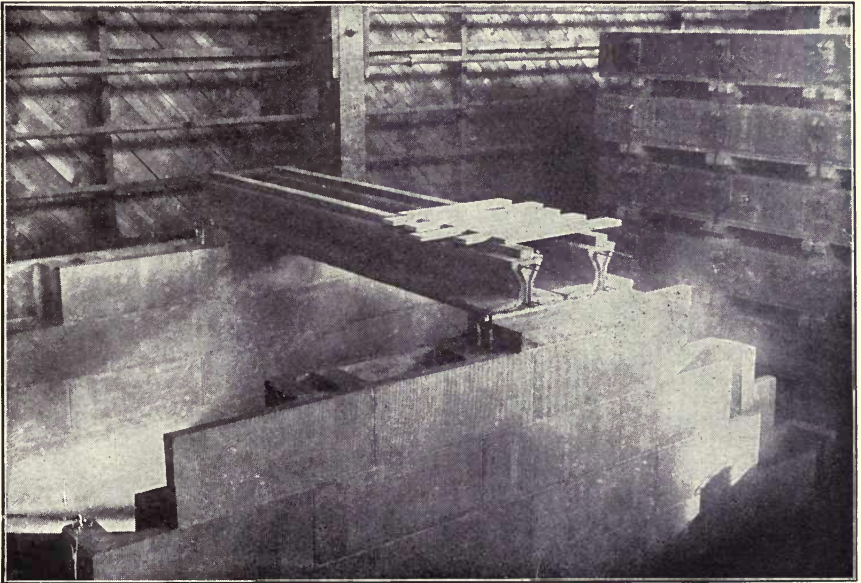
Standard Floor Joists Resting on Concrete Block Walls. (See p. 193.)
